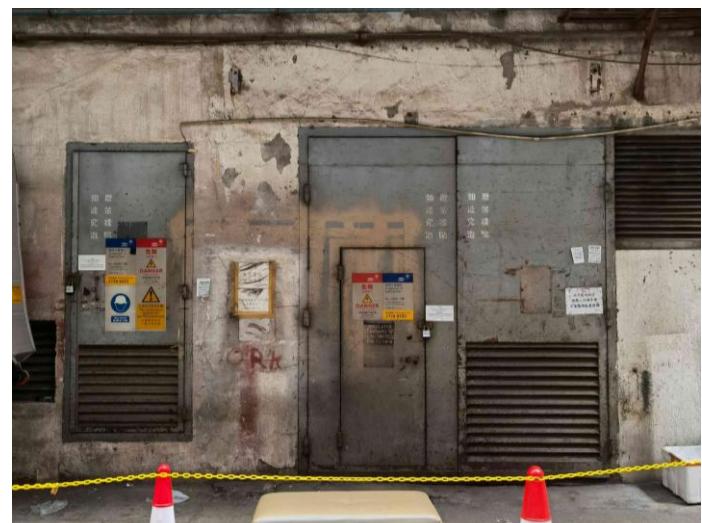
Transformer room for 24 Tai Yau Street at G/F
